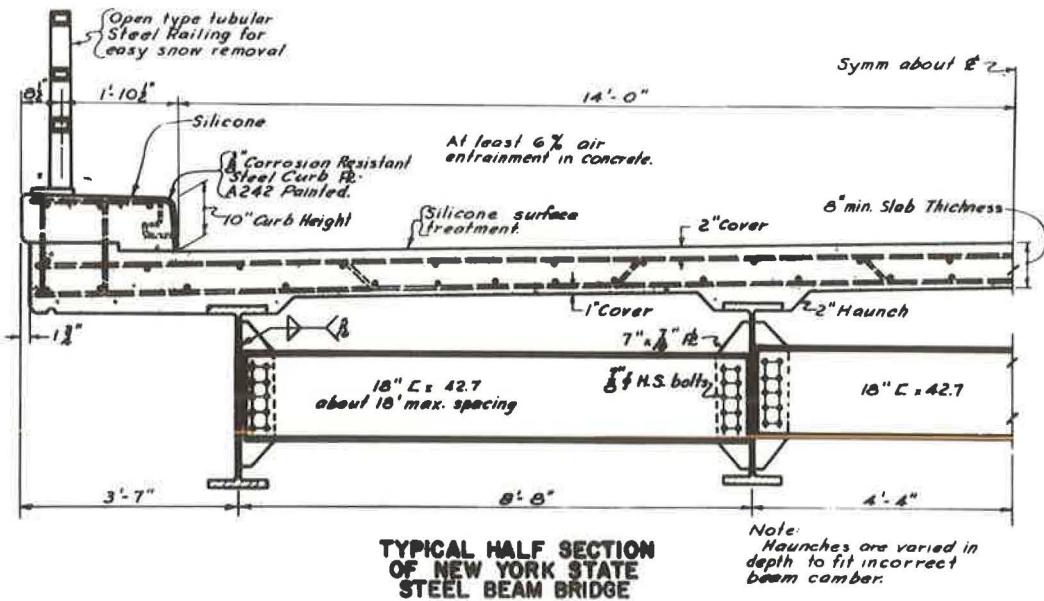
Method used to protect steel I-beam bridge decks from salt damage.
